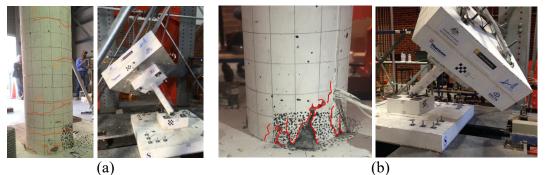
Damage pattern of the two columns: a) monolithic column; b) segmental column
